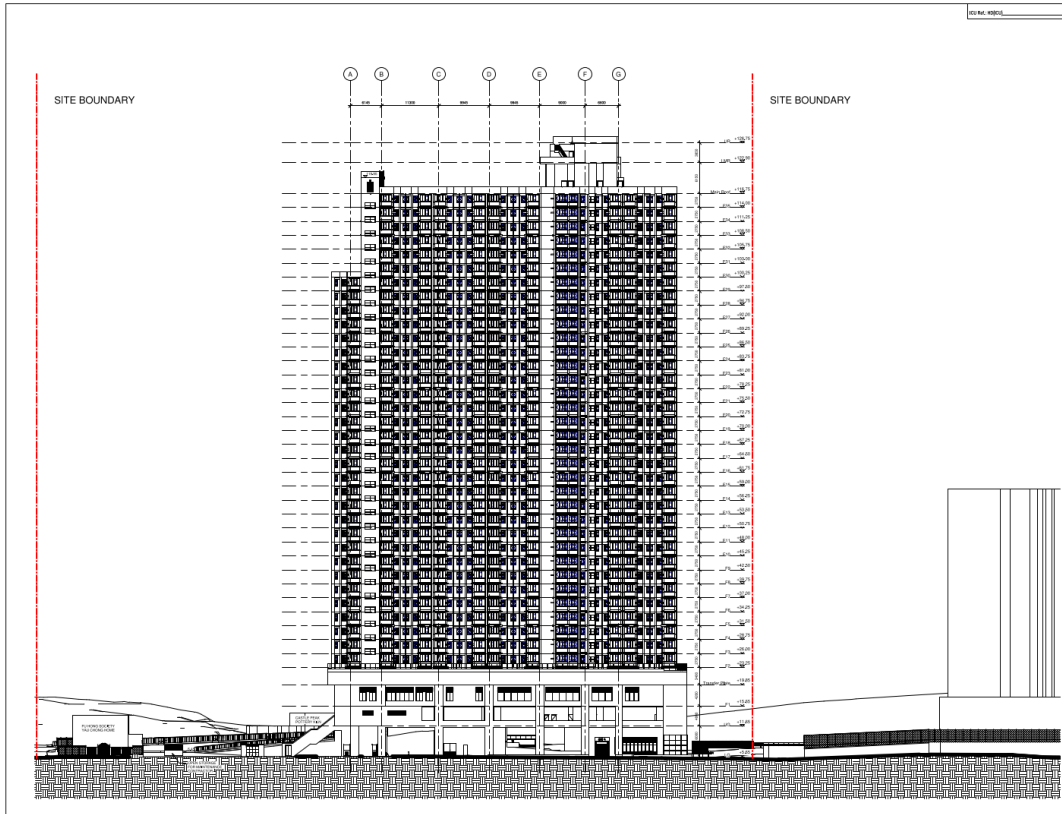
Indicative Plan of Proposed Scheme (Section A-A)
